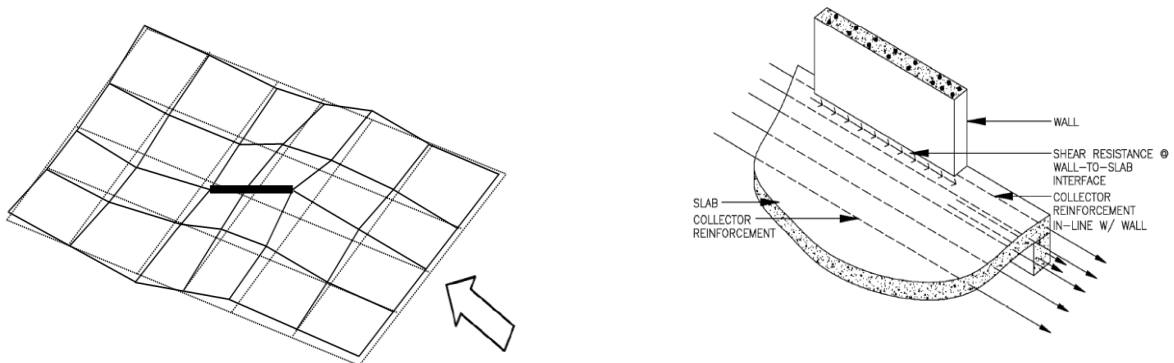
a) Deformation compatibility of wall and surrounding slabs in a typical floor b) slab to wall connection
